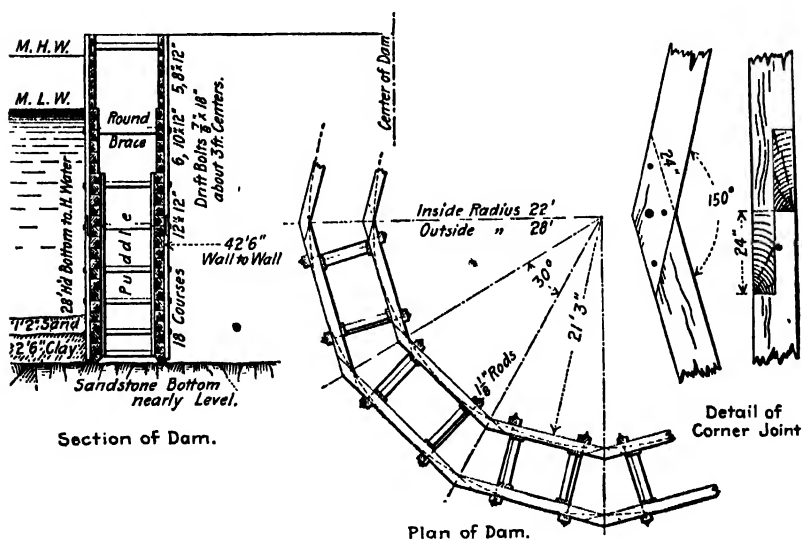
Cofferdam for Pivot Pier of Arthur Kill Bridge.
